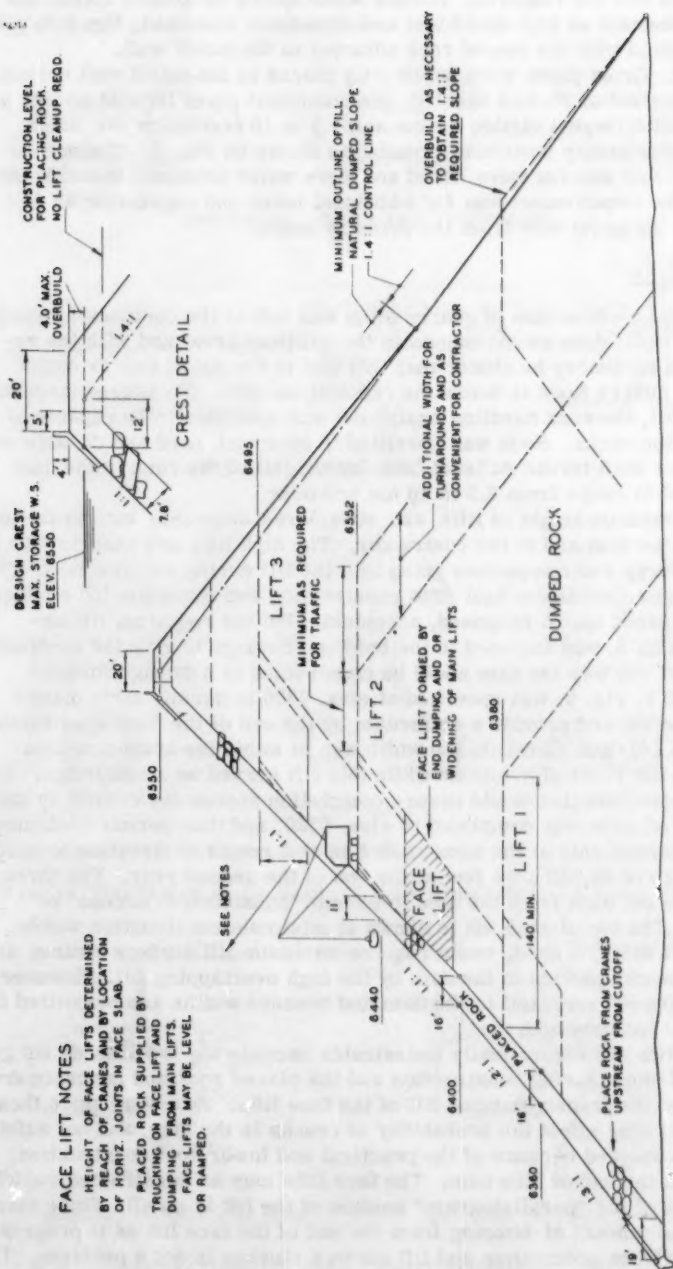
PROPOSED CONSTRUCTION METHOD - MAIN SECTION - WISHON DAM
